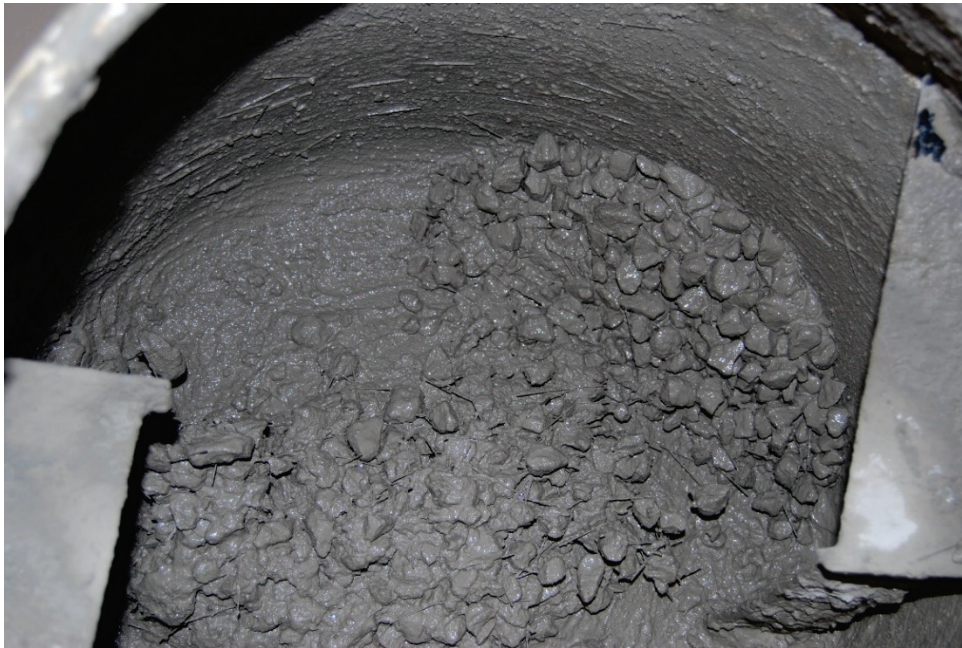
Fiber-reinforced concrete added to the beam mold and vibrated (3% loading).
